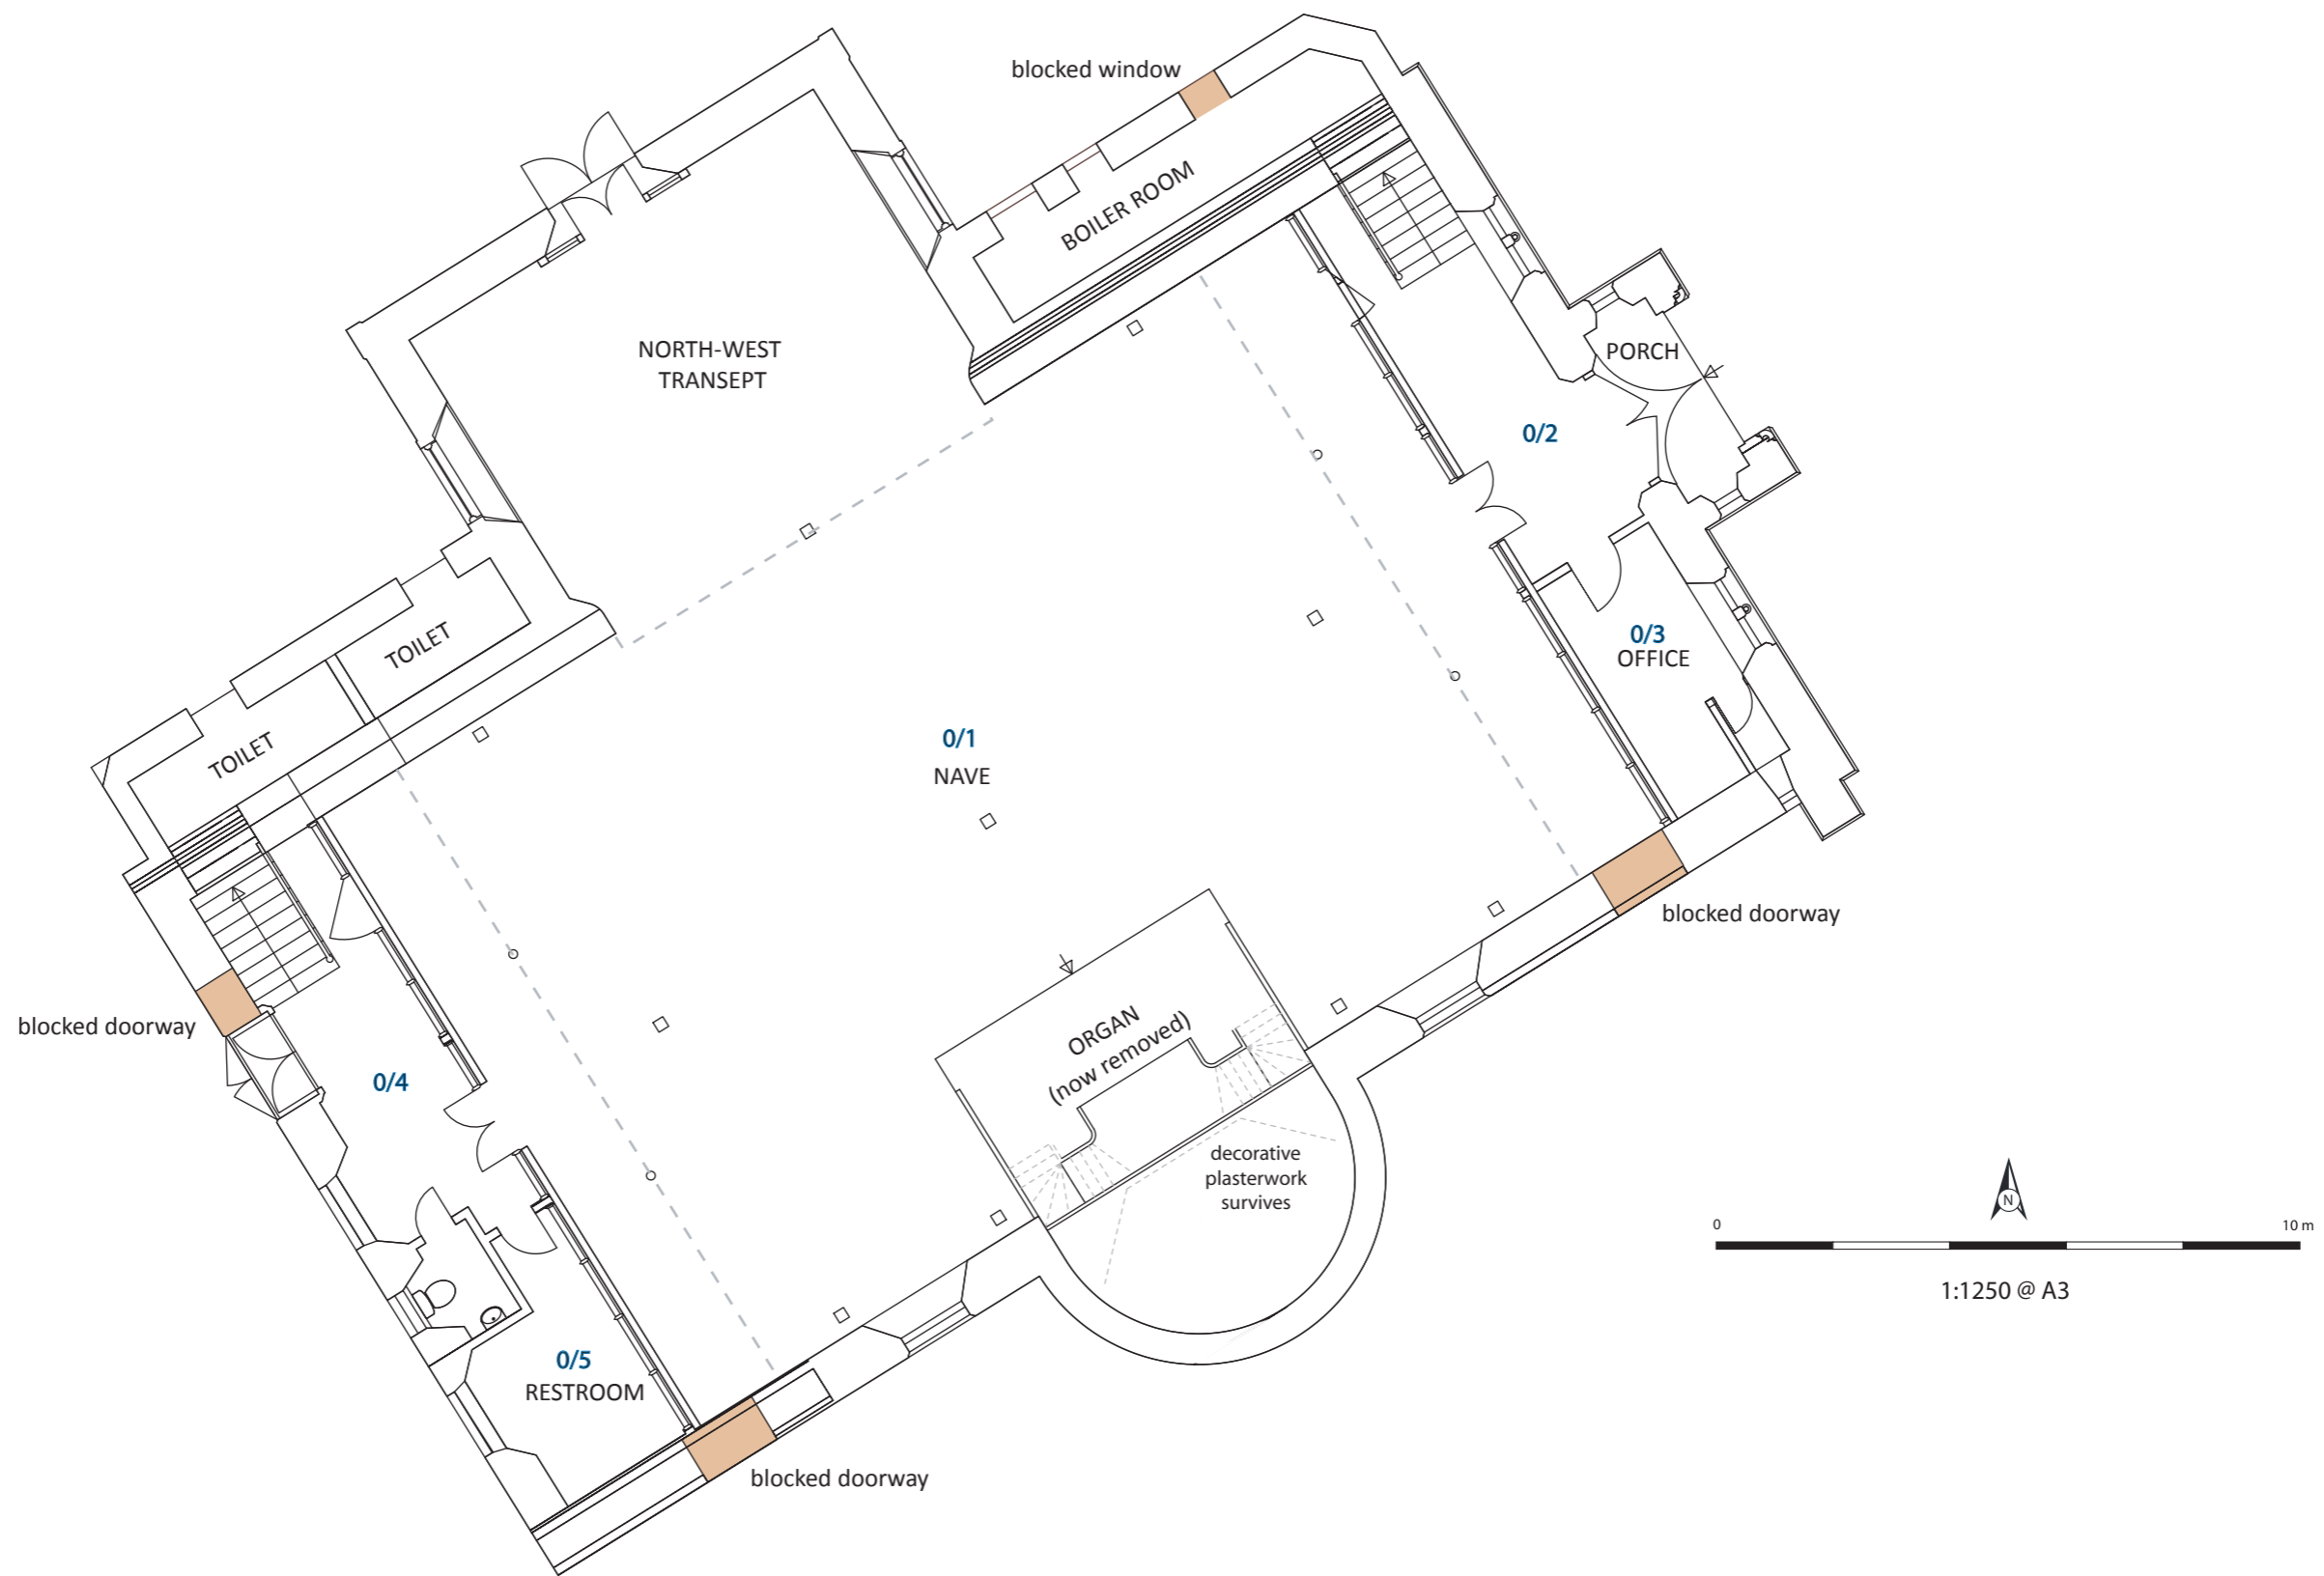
Buccleuch Church, 33 Chapel Street, ground floor plan
